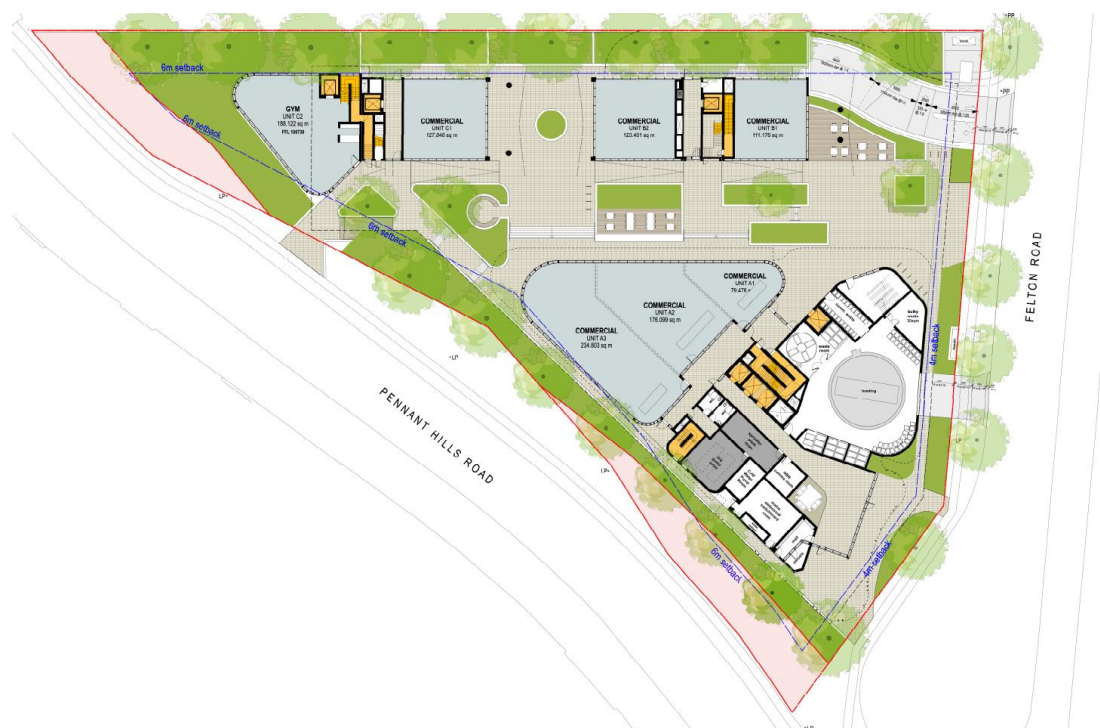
Level 1 Floor Plan (Childcare Centre)
